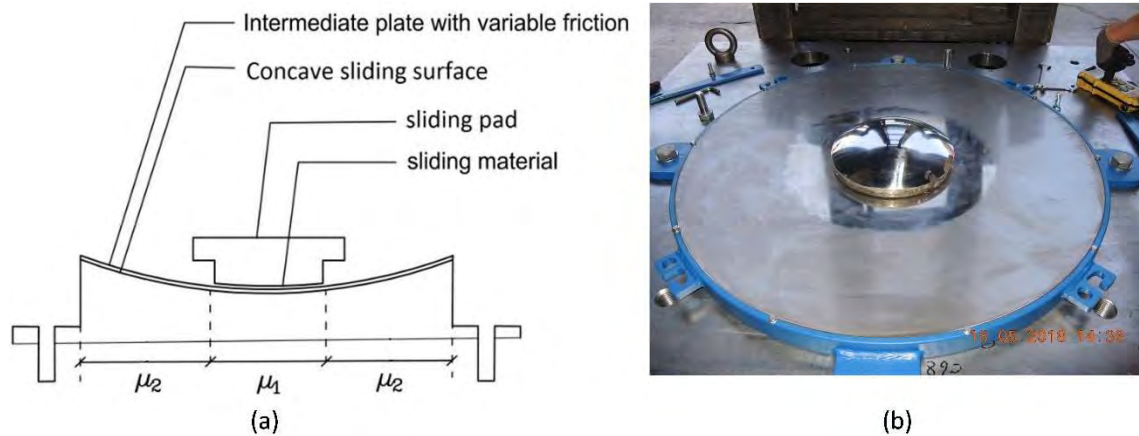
(a) Schematic drawing of a two-ring VFS bearing; (b) Plan view of the concave sliding surface and the slider of the prototype VFS bearing
